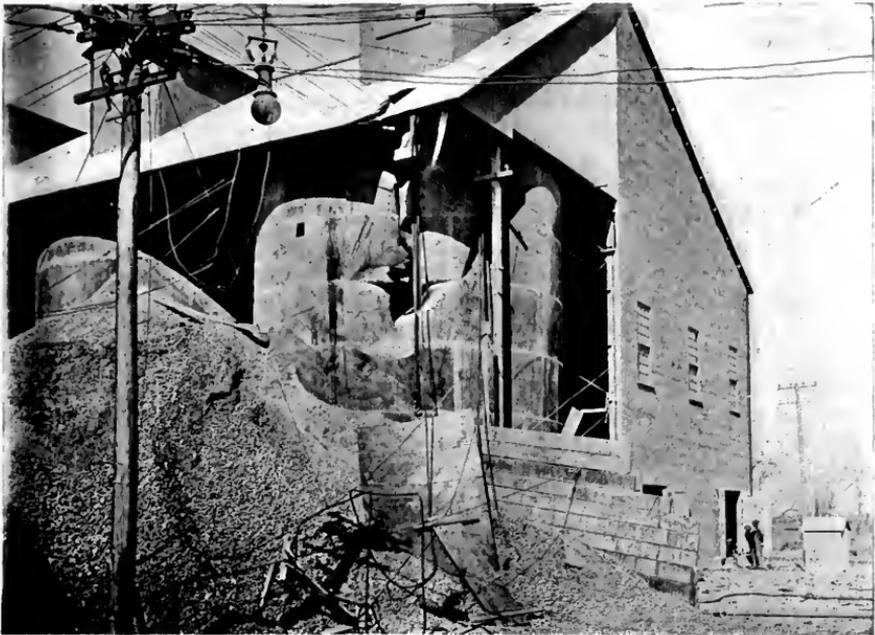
SHOWING THE DAMAGED STORAGE TANK.
